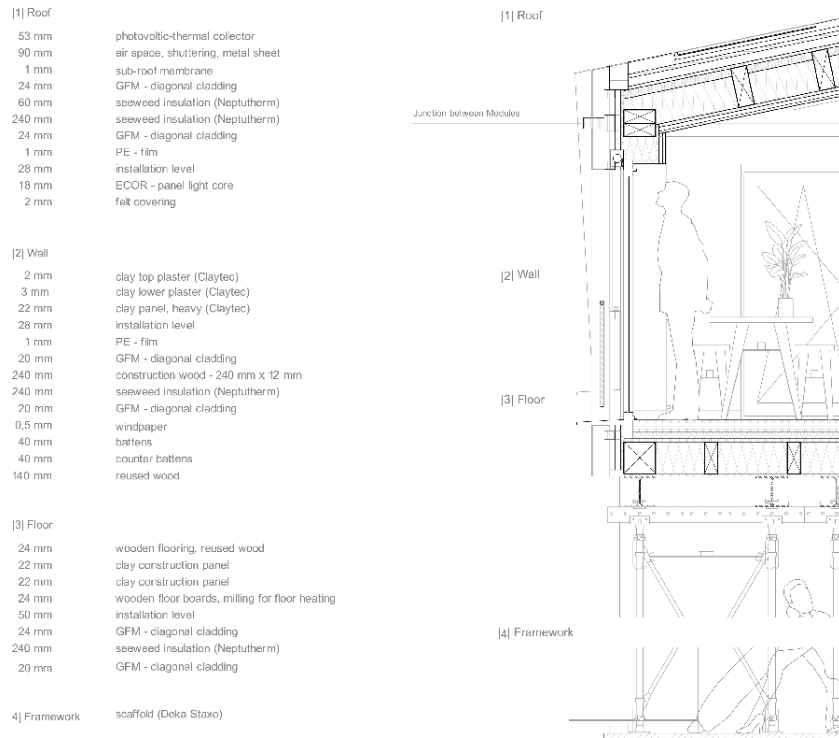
Section through exterior wall, roof and floor of building unit (HDU).
